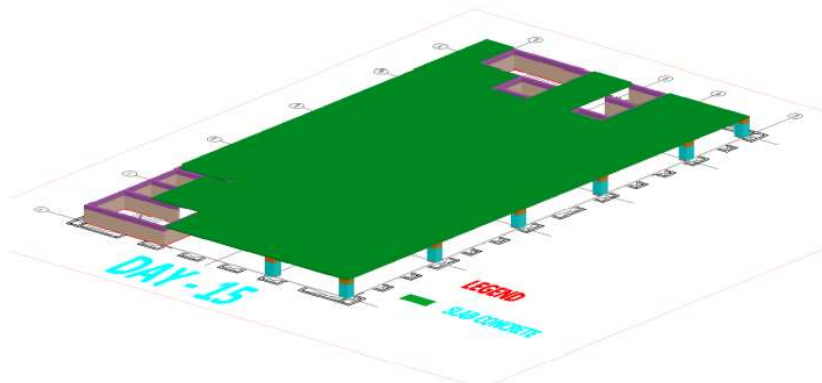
On the final day, Day 15th we have successfully casted the roof slab.
